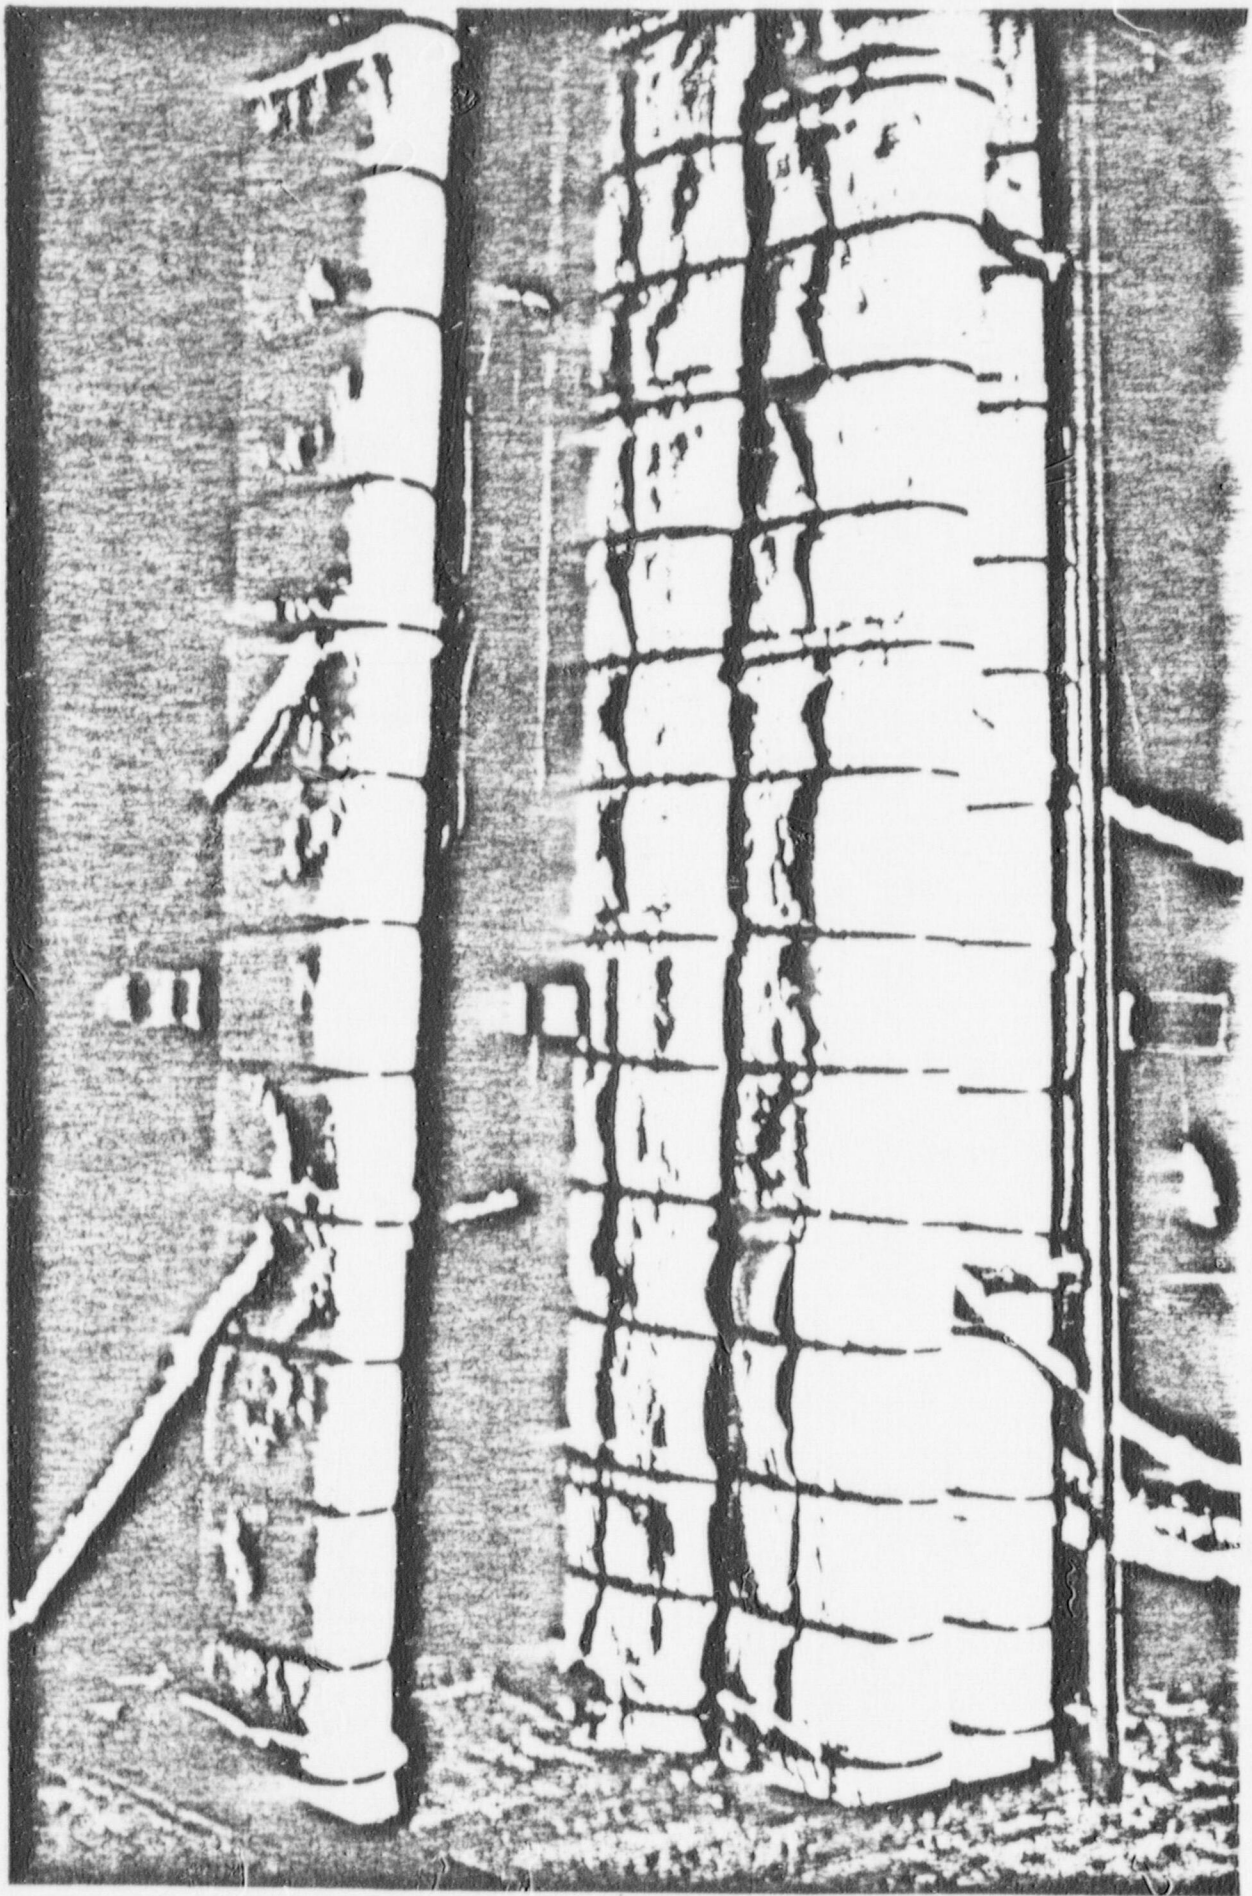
TEST ASSEMBLY PRIOR TO FIRE TEST
